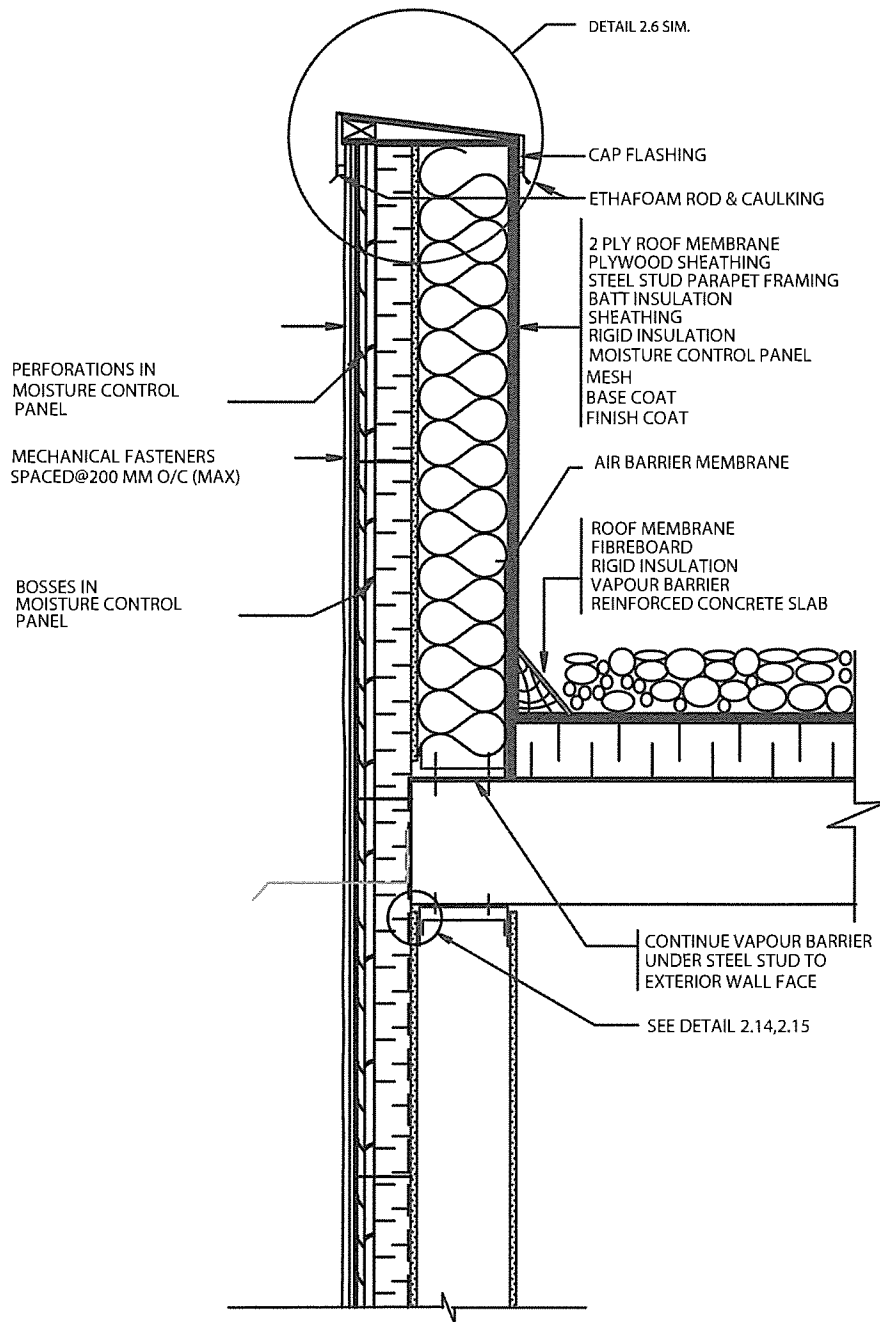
ACRYLIC STUCCO/ STEEL STUD DETAIL AT SLAB EDGE
